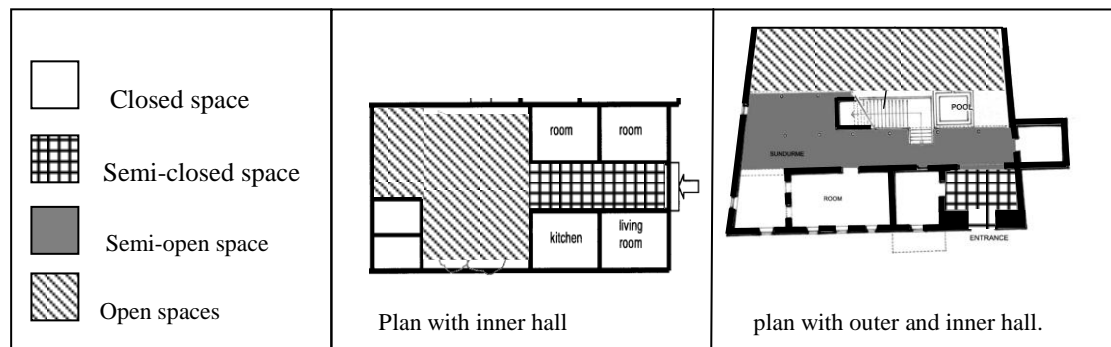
four spatial elements in the formation of house plans (adapted from Oktay, 2001 ; Pulhan & Numan, 2006)
